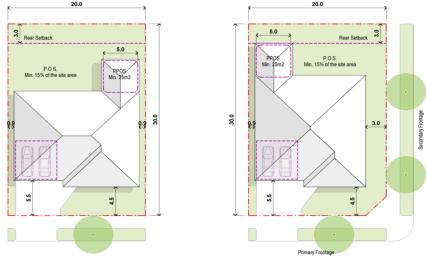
Typical 600m<sup>2</sup> Dwelling House
